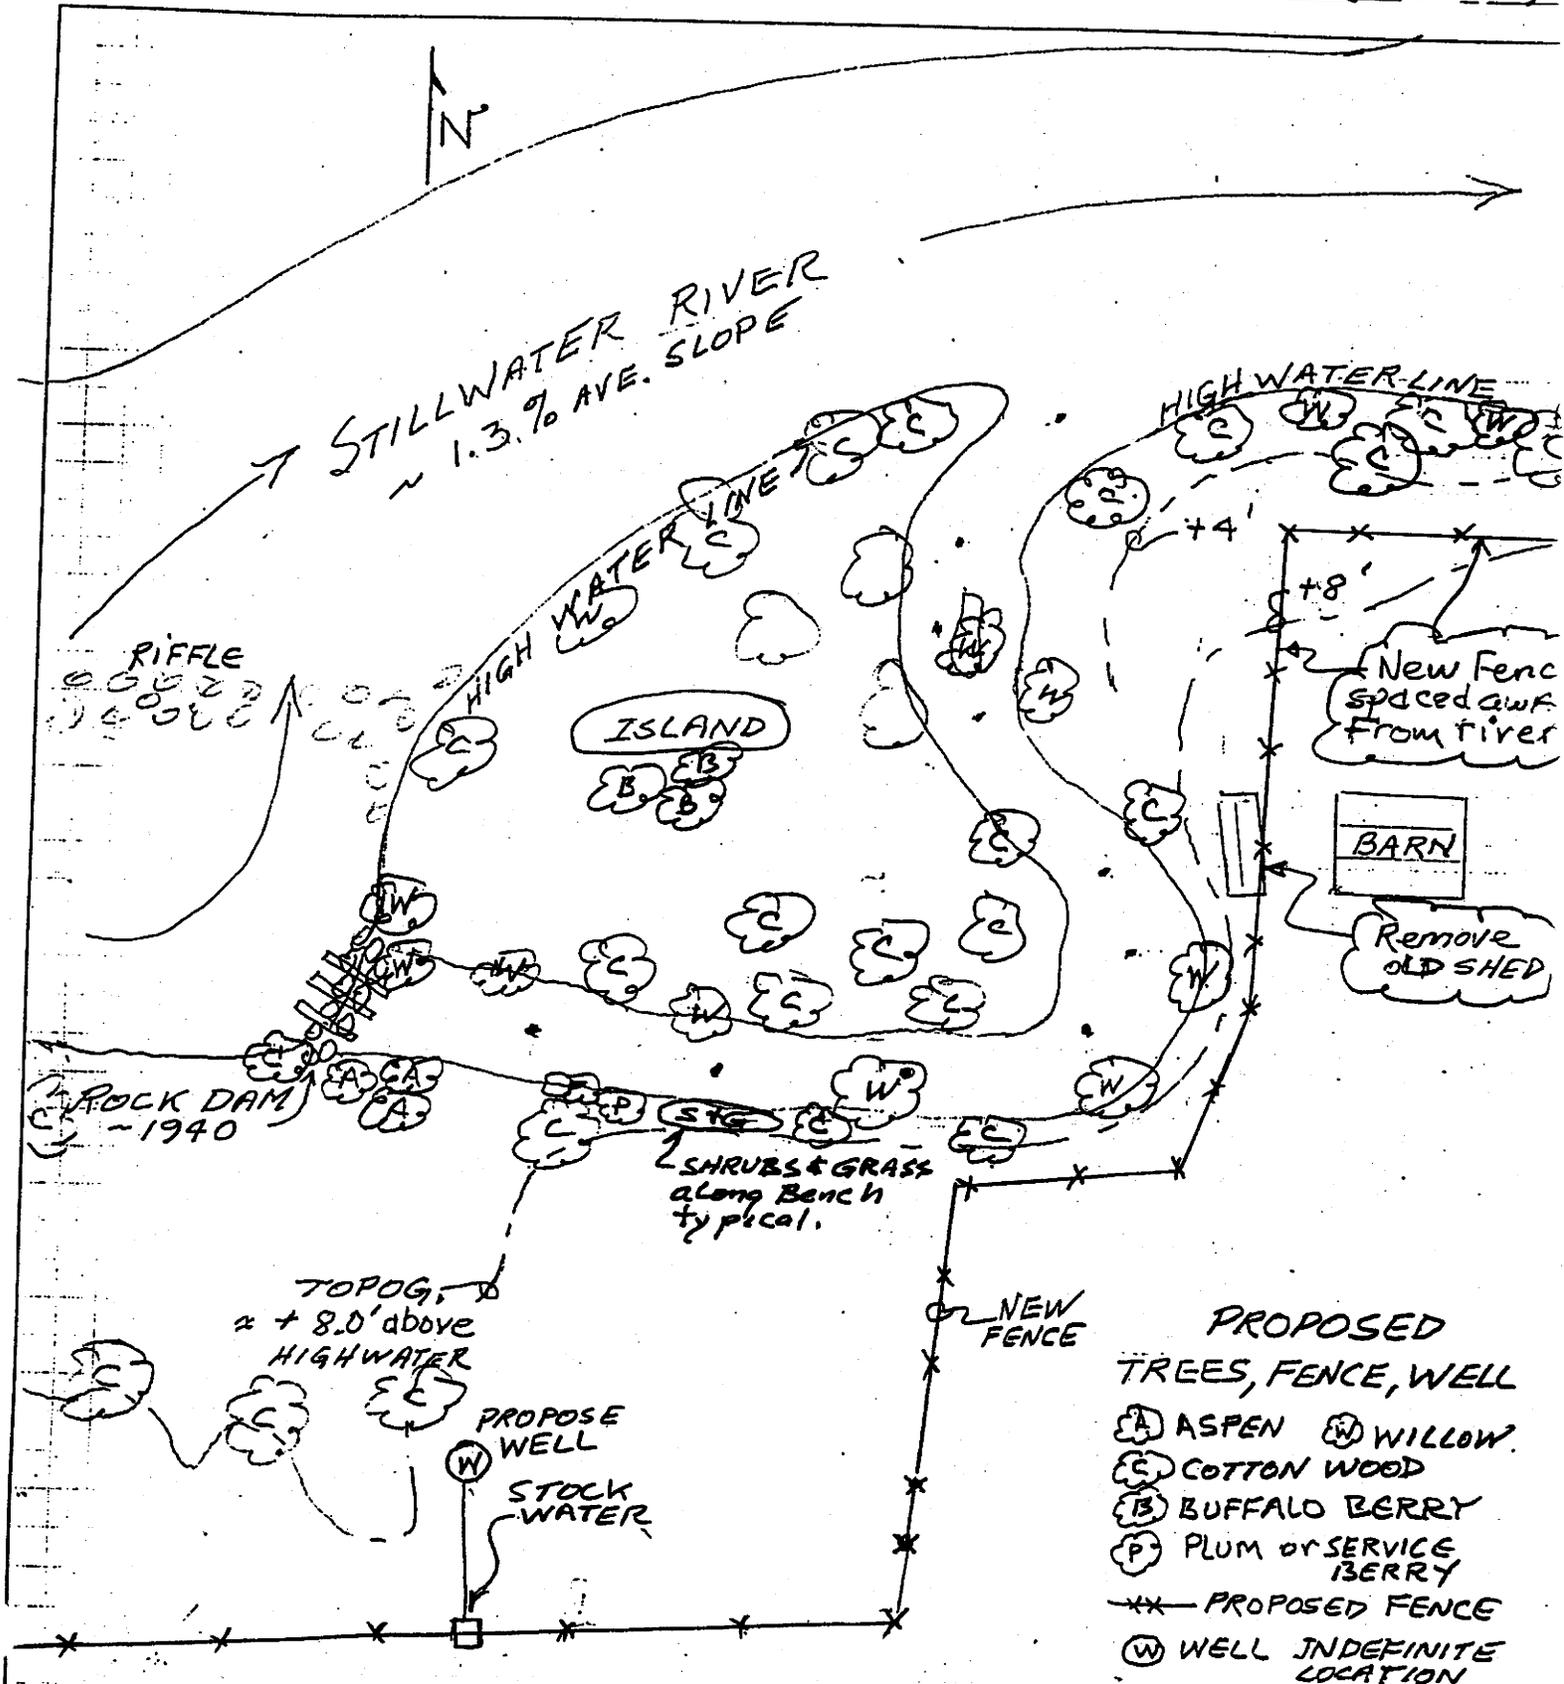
Plan View of Proposed Fencing, Stockwater and Revegetation Work on the Stillwater River.
